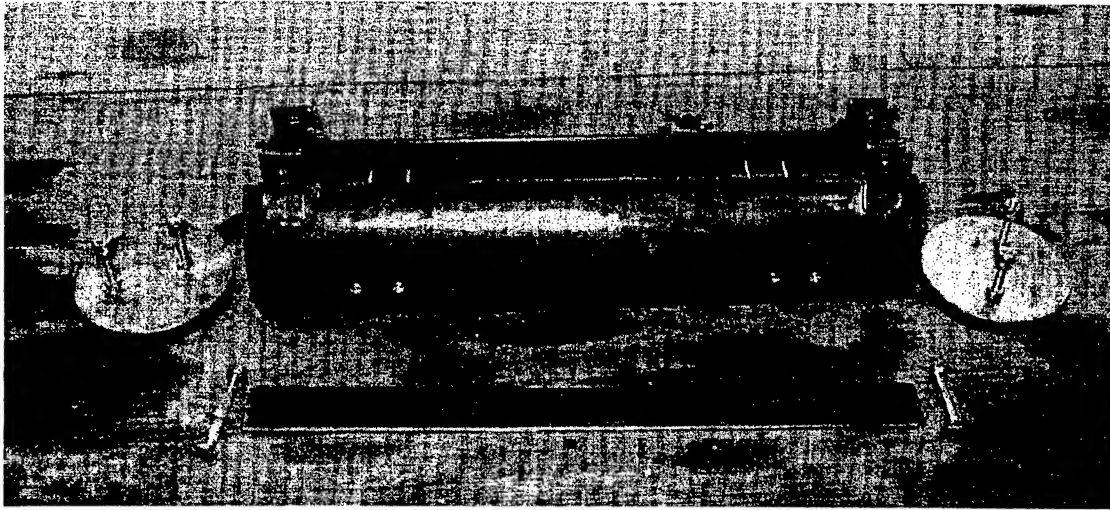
Specimen Mold for Creep and Shrinkage Testing
